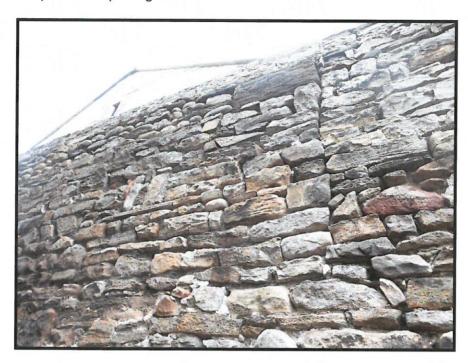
& 04 Showing eroded stone & typical deterioration of mortar joints
